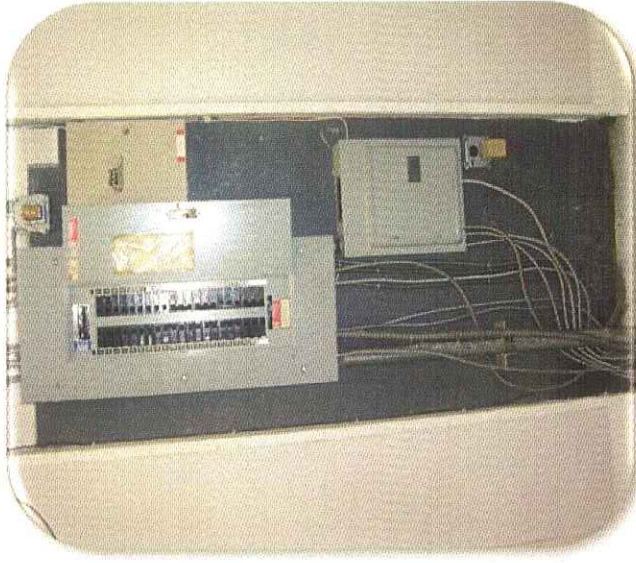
Electrical Closet with two Panel-boards on Each Floor
